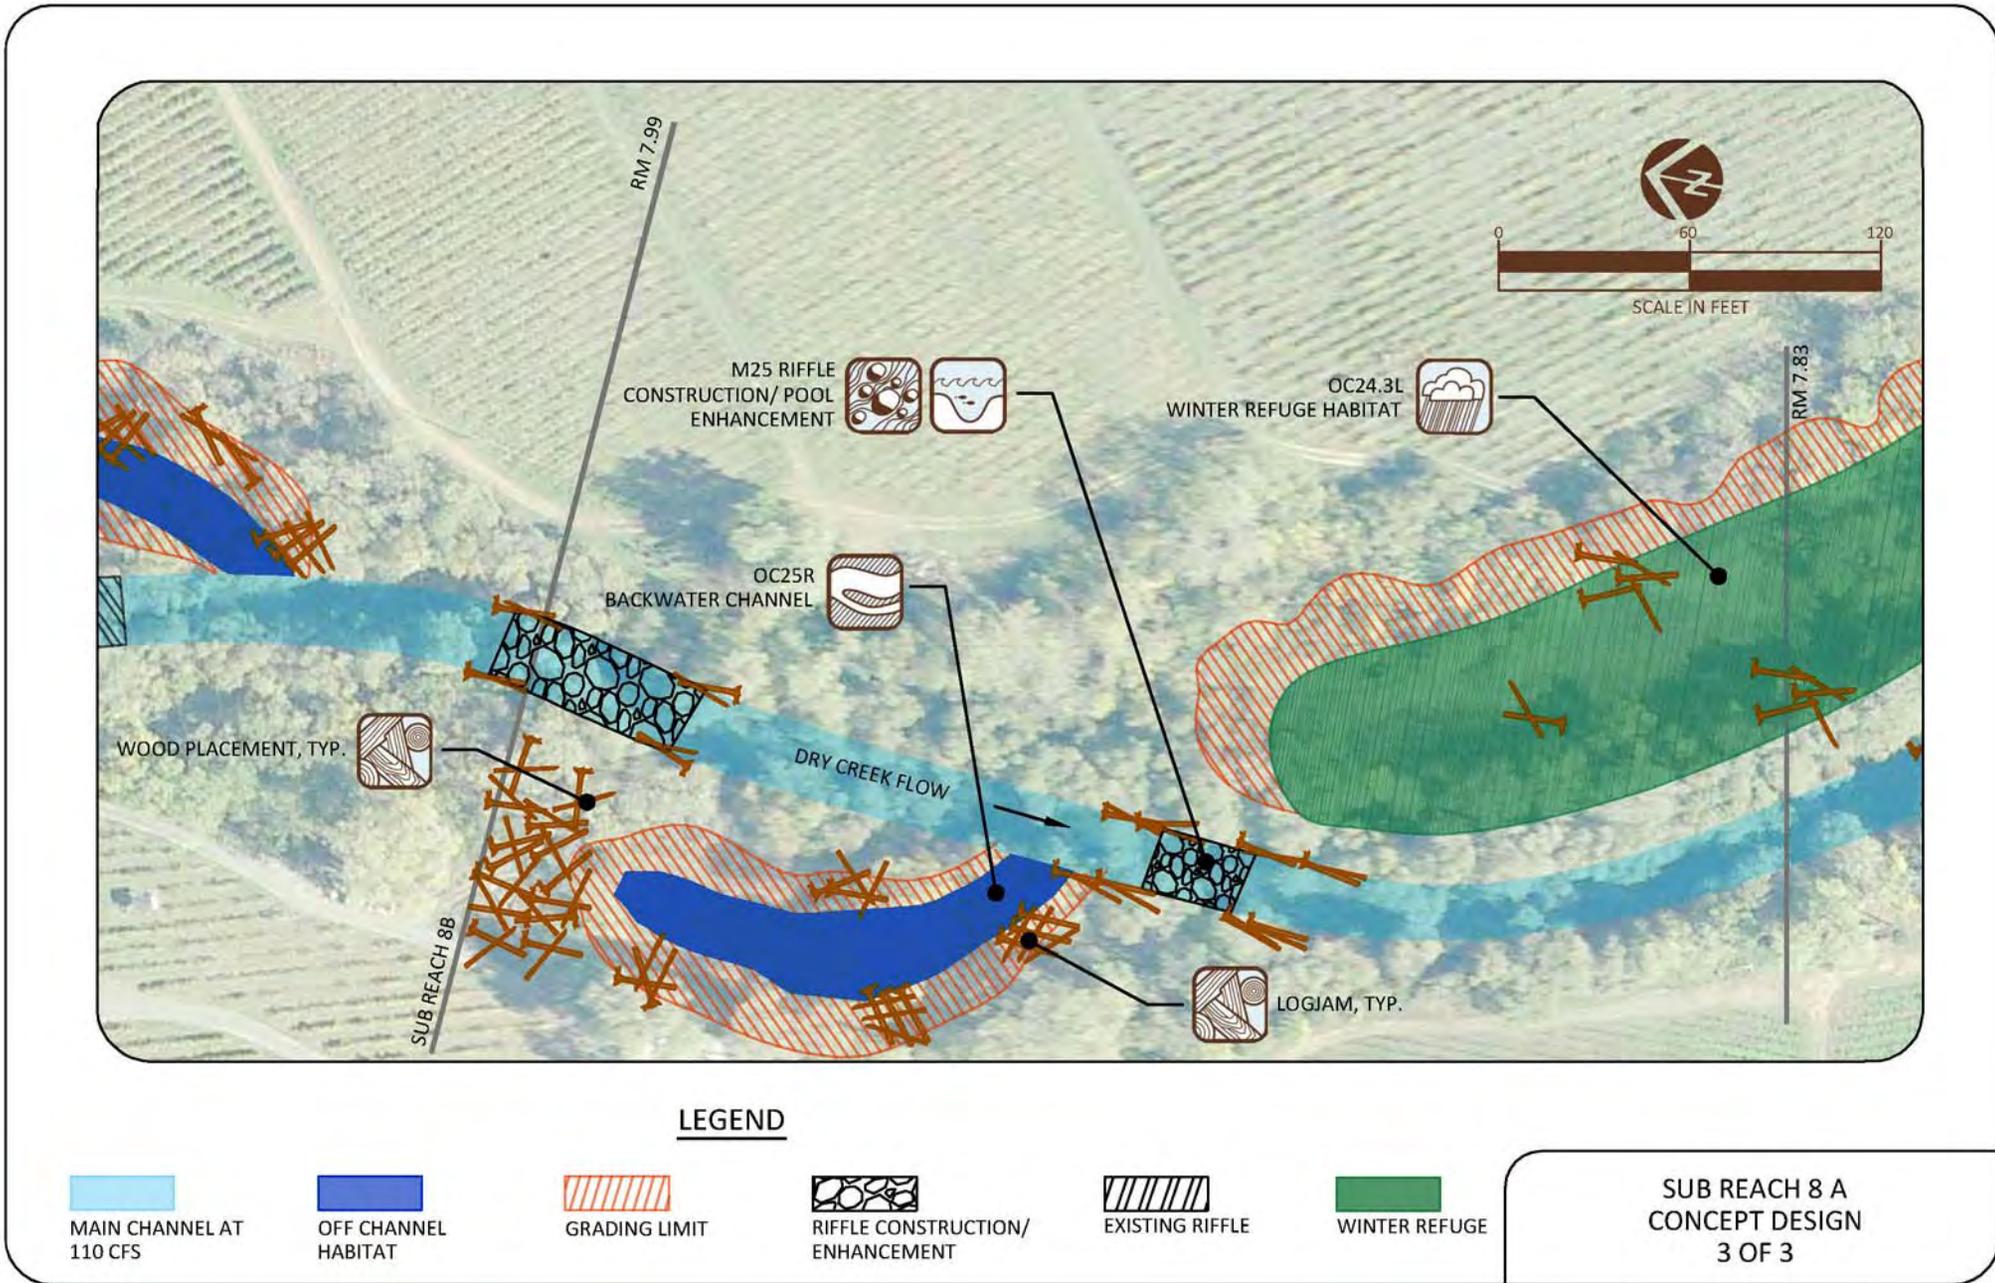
Sub-reach 8a conceptual design detail sheet 3 of 3.
